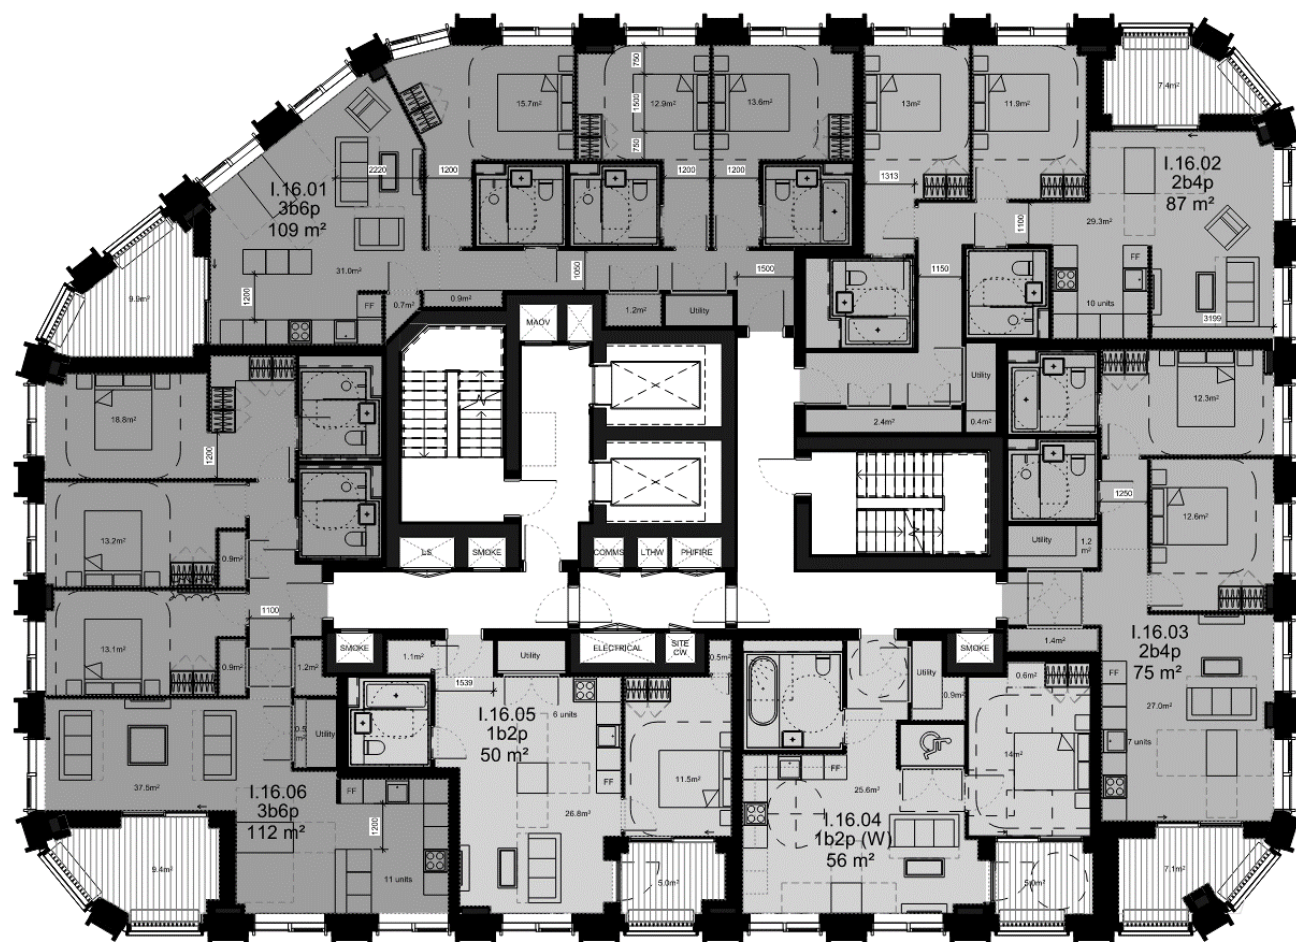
Example of Residential Apartments Floor Layout (Block I Levels 15-22 Layout)
